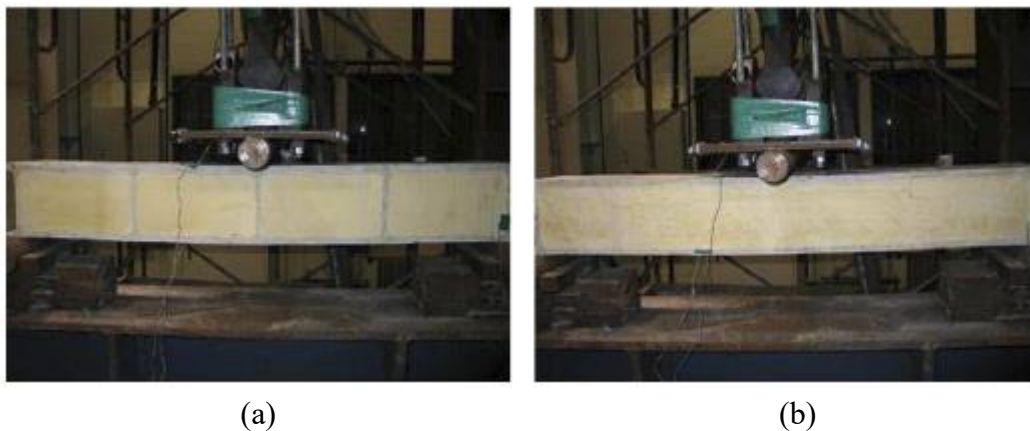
GFRP bridge deck filled with polyurethane foam (a) with and (b) without webs (Zi et al. 2008)
